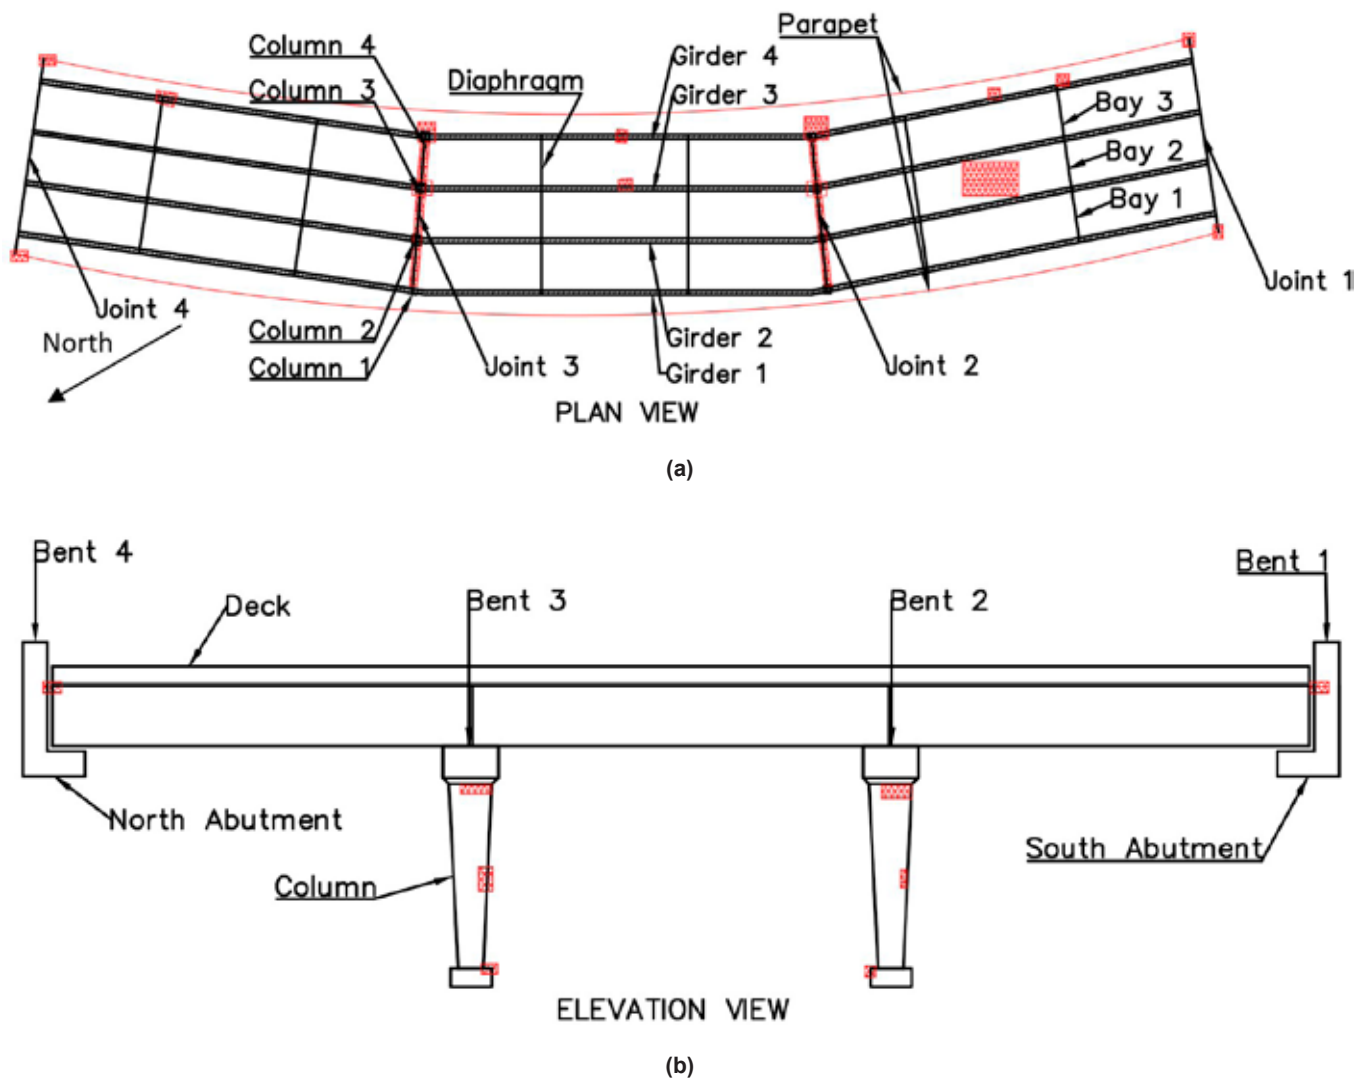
Timber girder bridge layout with identified damage: (a) damage on plan view; (b) damage on elevation view. (Red rectangles in plan and elevation views indicate damage, and red lines in plan view denote minor cracks along the parapet and rusting in railing in a longitudinal direction.)
